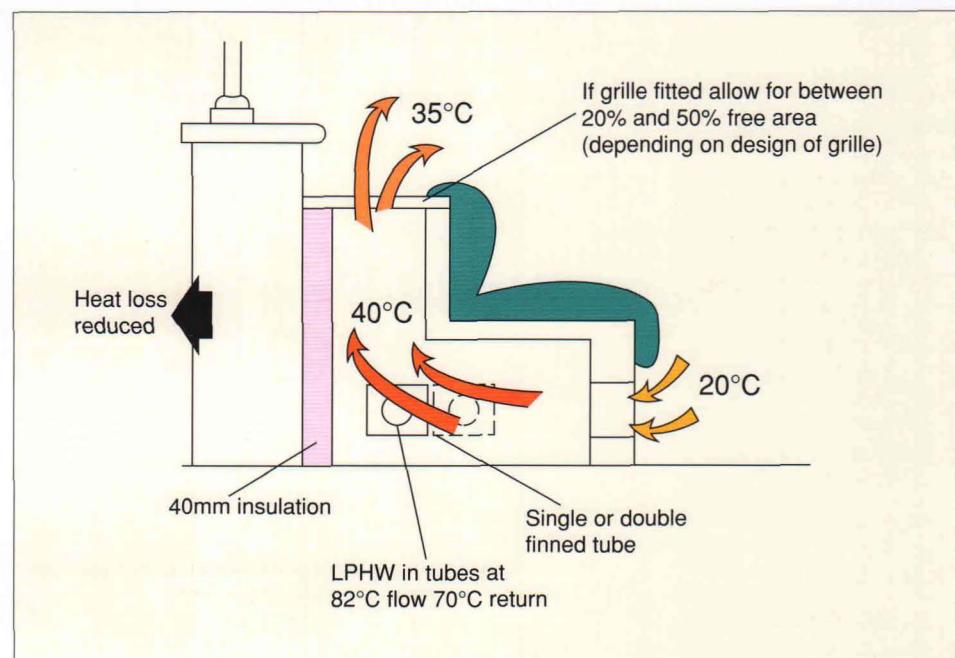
Cross-section of fixed seating against an outside wall showing finned tube heating
